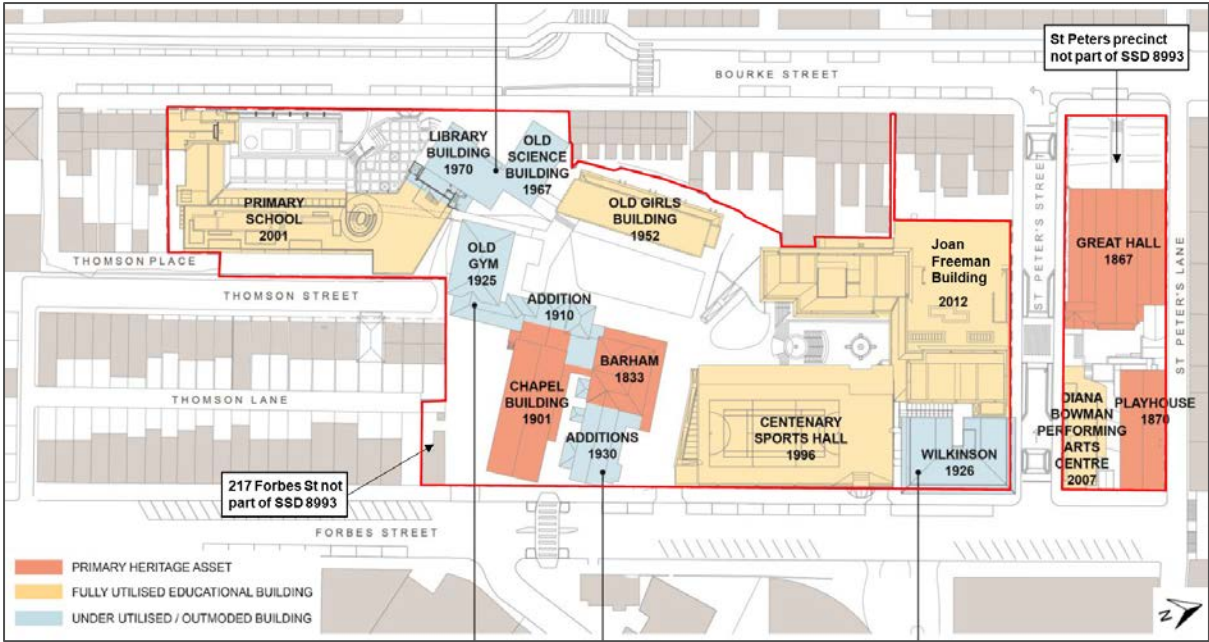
| Campus layout – SCEGGS Darlinghurst (Source: Department's Assessment Report 2020)
